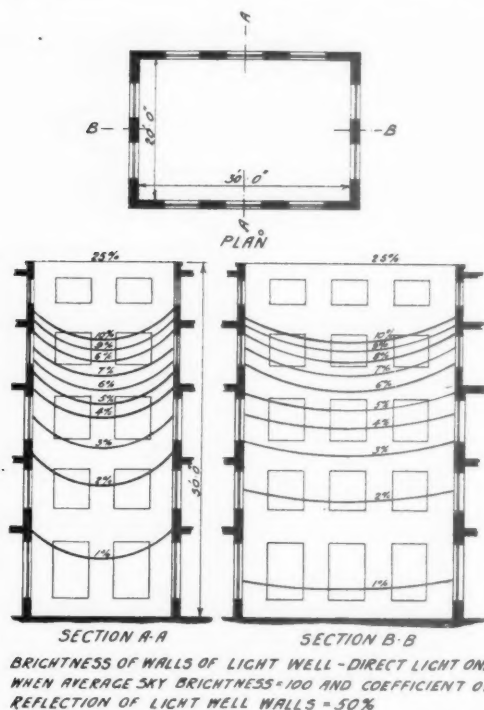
APPARENT BRIGHTNESS OF WALLS OF LIGHT WELL
